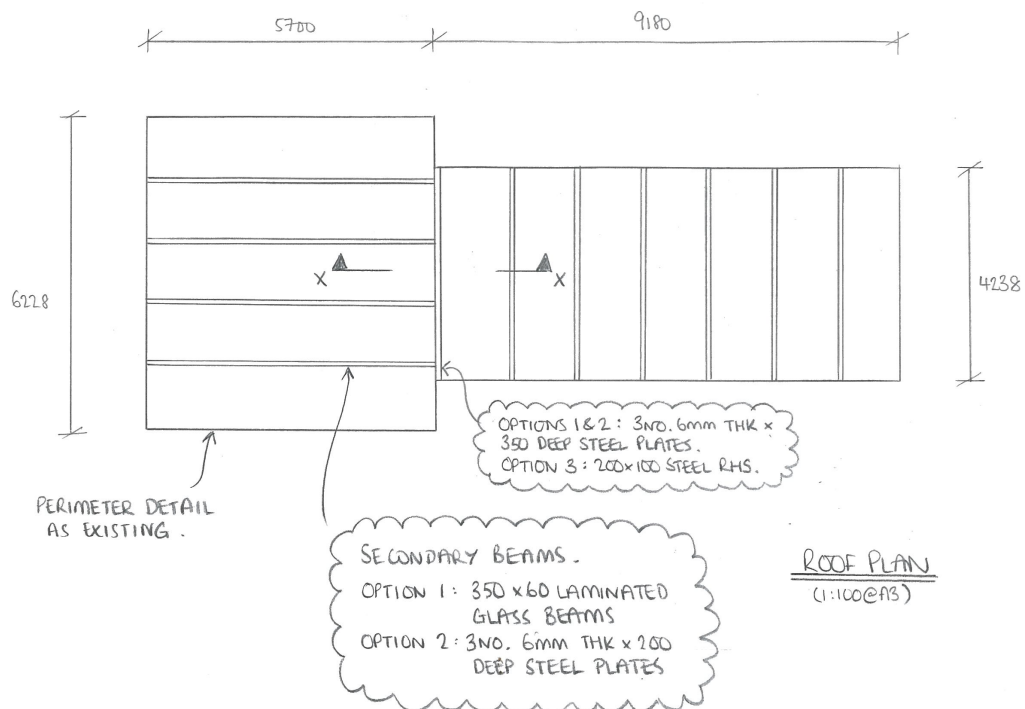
Extract from Price & Myers review of structural options for the Winter Garden, showing a typical plan of the primary beams
